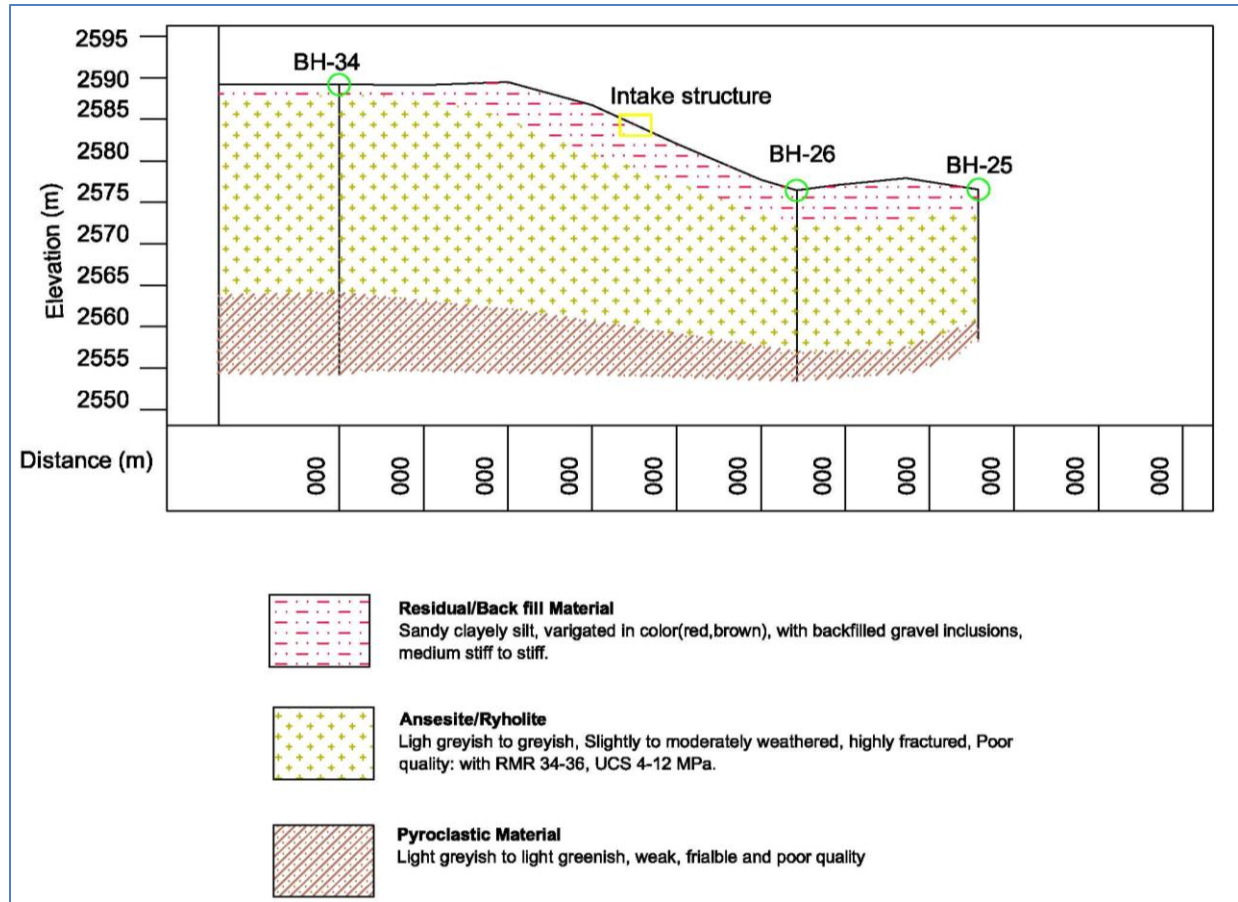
Engineering Geological Cross-section at the Intake Structure site
